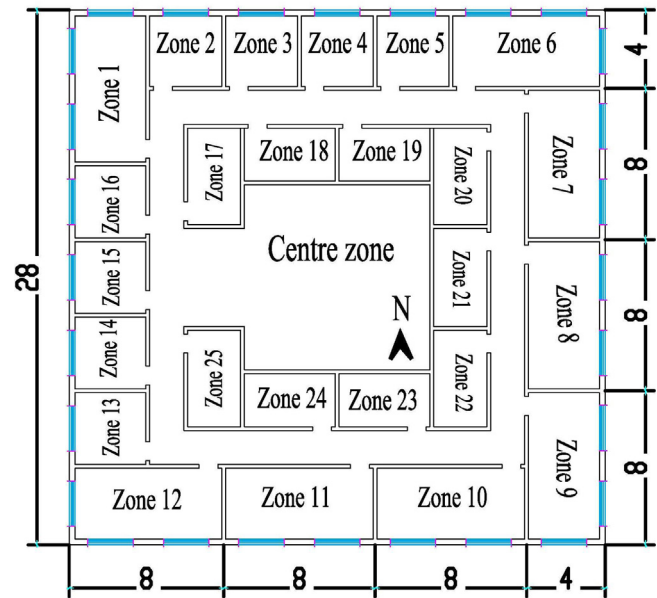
Typical floor plan of the building (unit in drawing: meter).
